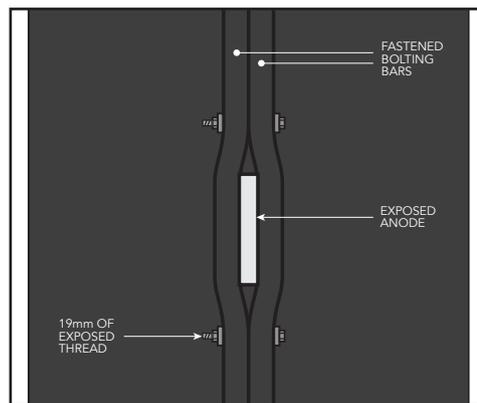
Finished jacket application with bolting bars tensioned and fastened around the anode bracket.
